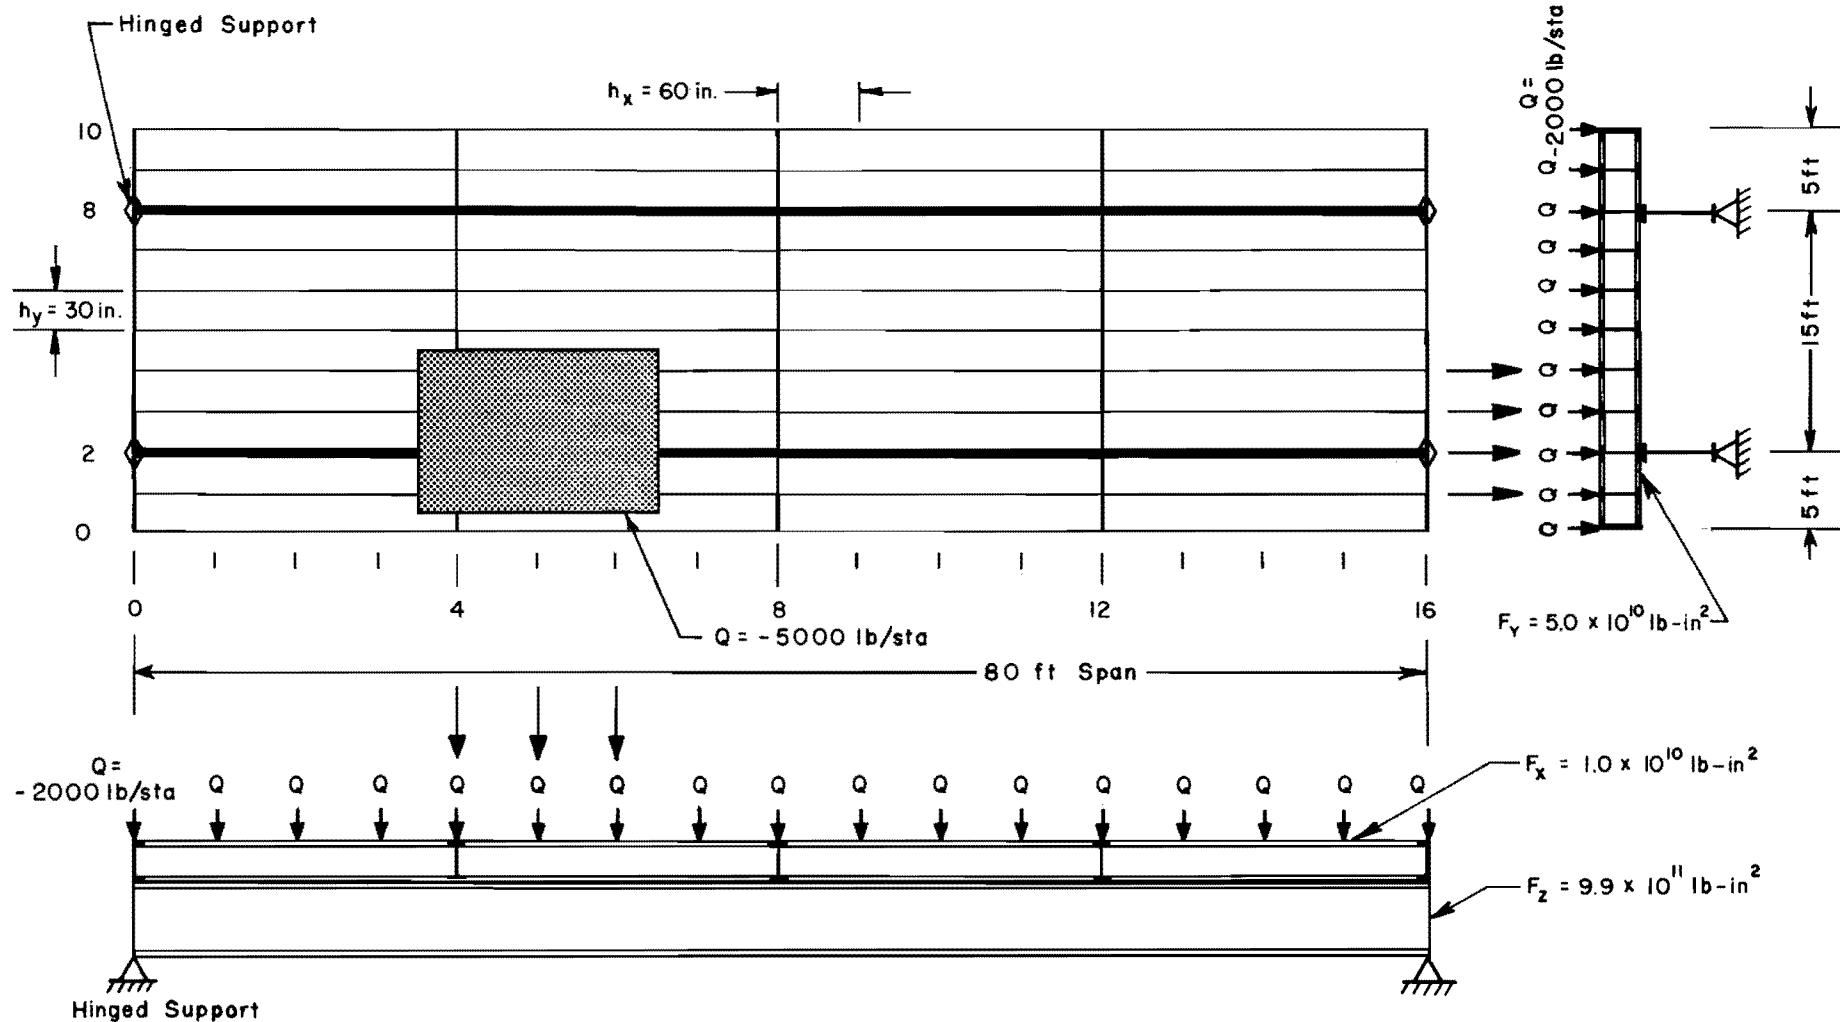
Example Problem 6.3. Girder and beam-diaphragm system of a bridge.
